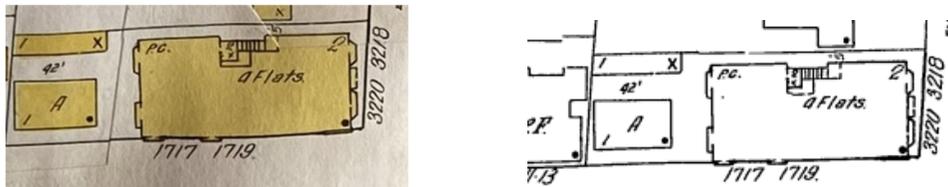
Site plans of 3218 Ellis Street in 1929 (left) and 1950 (right). North is up.
